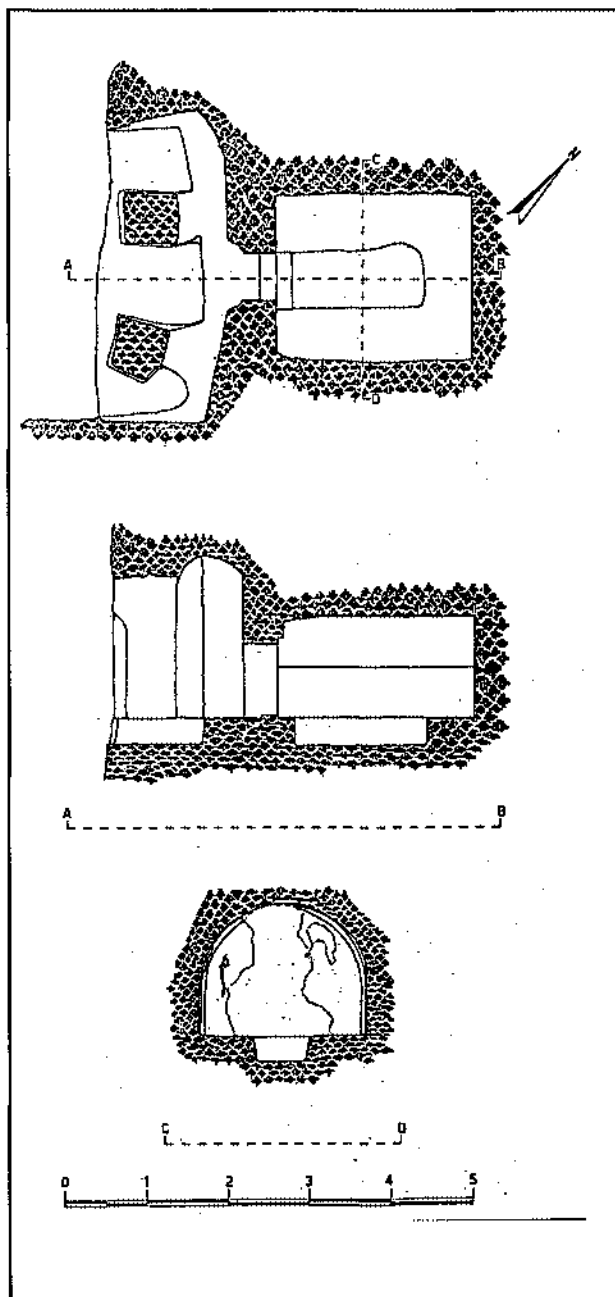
Keramos. Necropolis D. Tomb 1. Plan, sections
